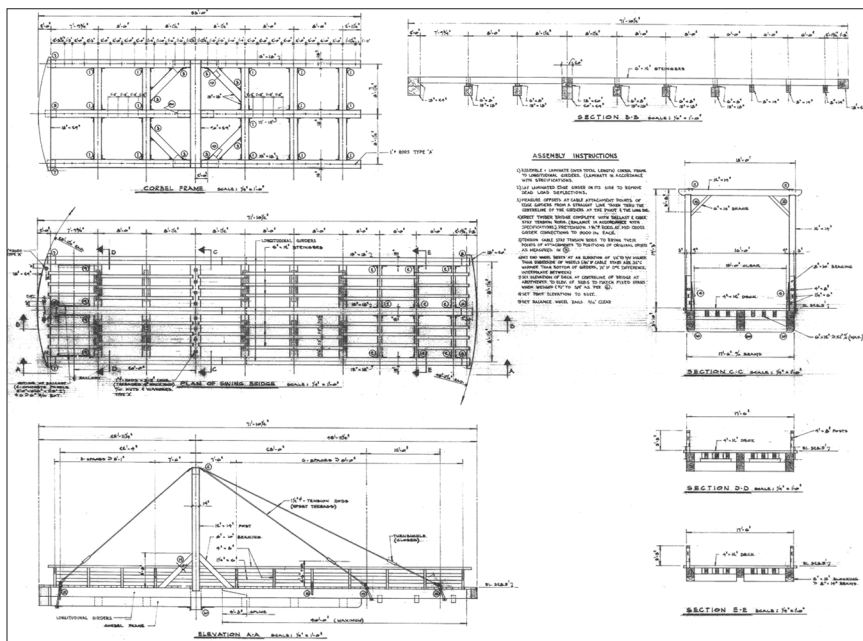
Drawing of the Brass Point swing bridge as reconstructed by Parks Canada in 1978. (Parks Canada, "Brass Point Bridge, Swing Bridge, Detail 1", Drawing 10-737, Sheet 112, n.d.)
